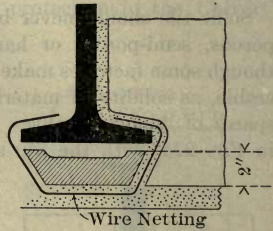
Detail of 2-in. Soffit Tile and Wire Netting.
